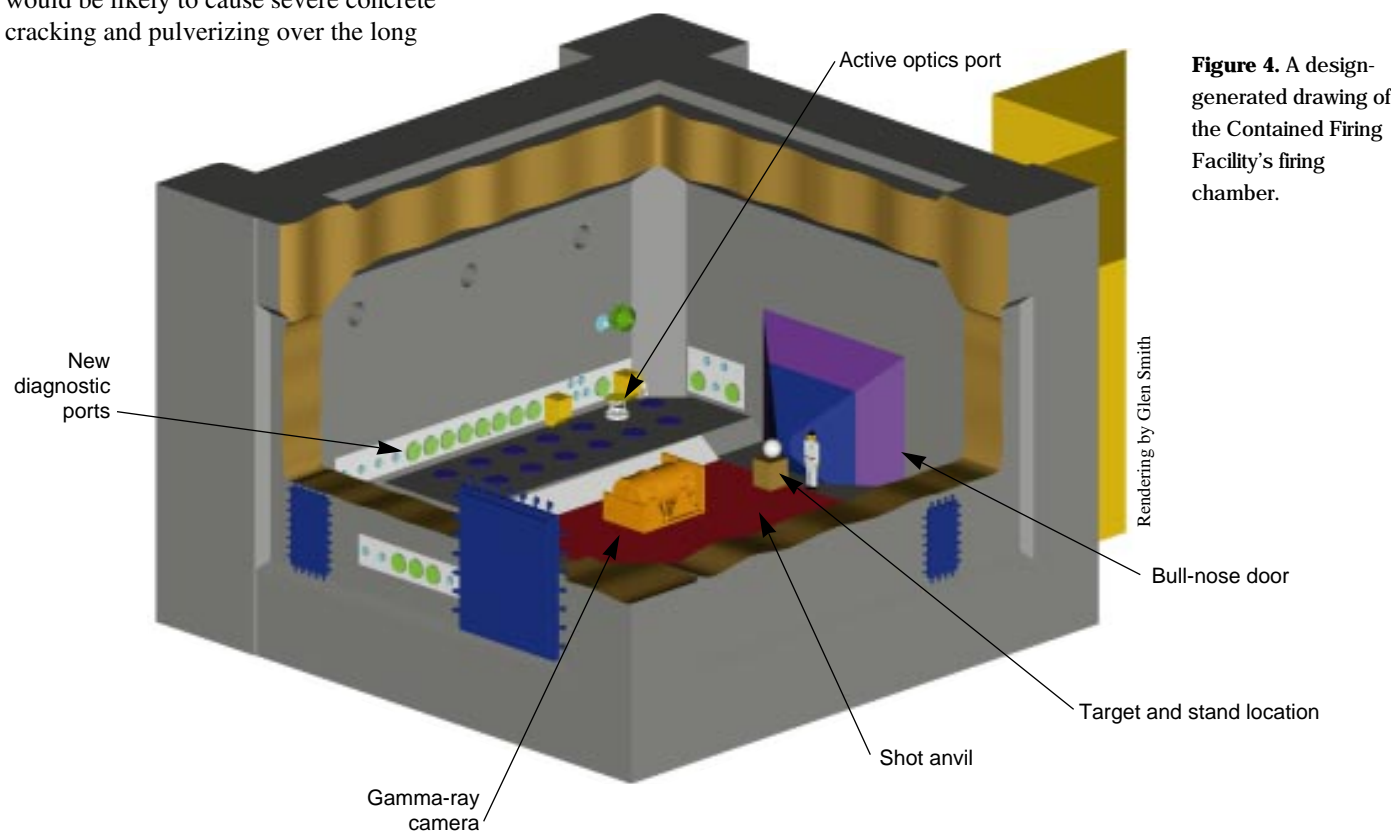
A design-generated drawing of the Contained Firing Facility's firing chamber.
